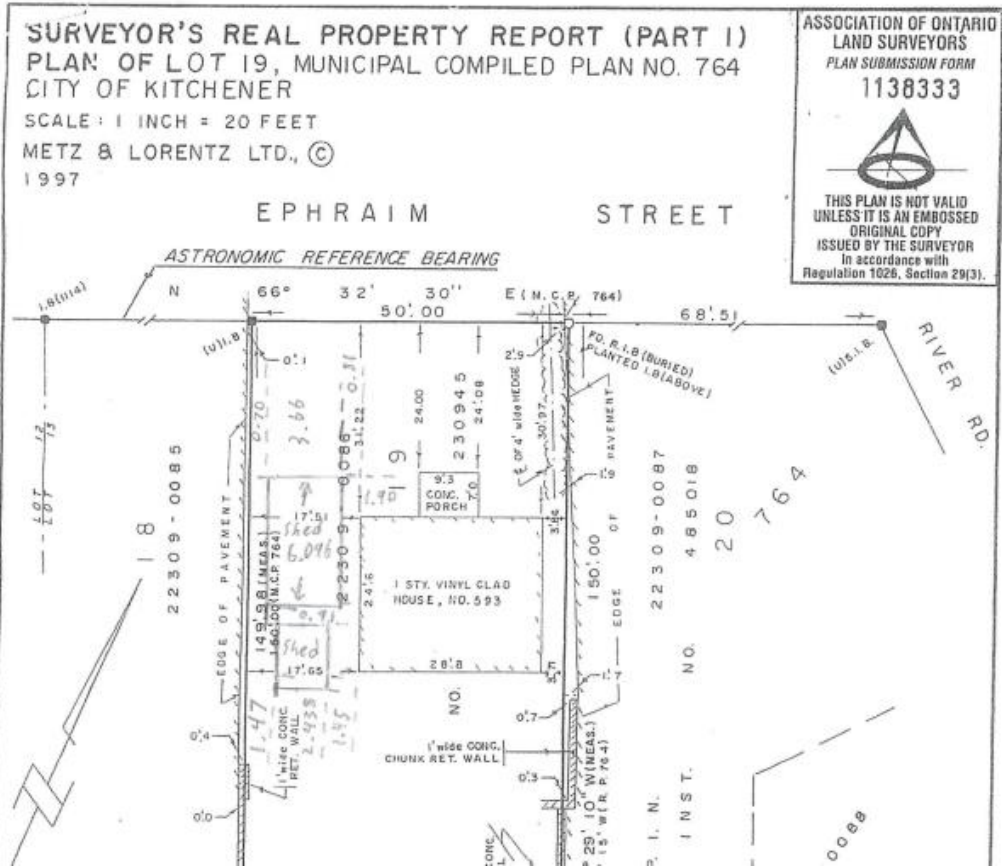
Survey plan for 593 Ephraim Street showing the location of the new shed.
